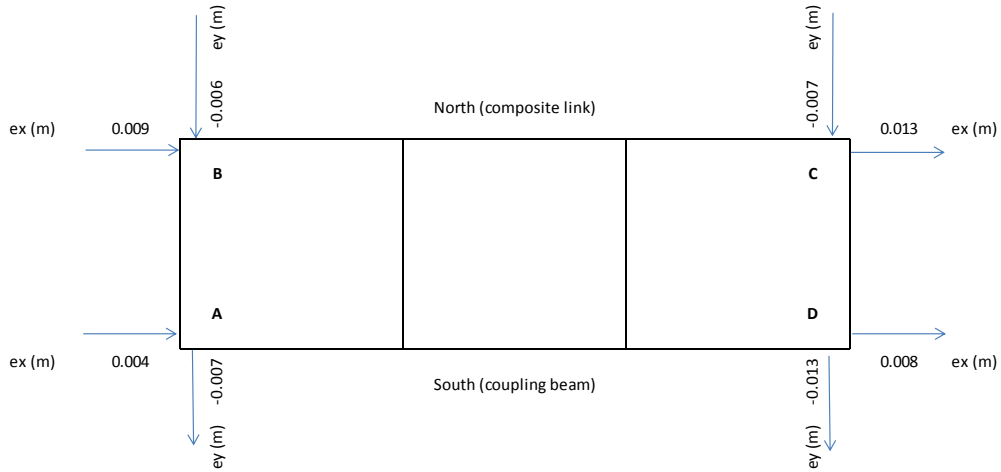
Out of plumb, 2nd measurement, 2nd floor
